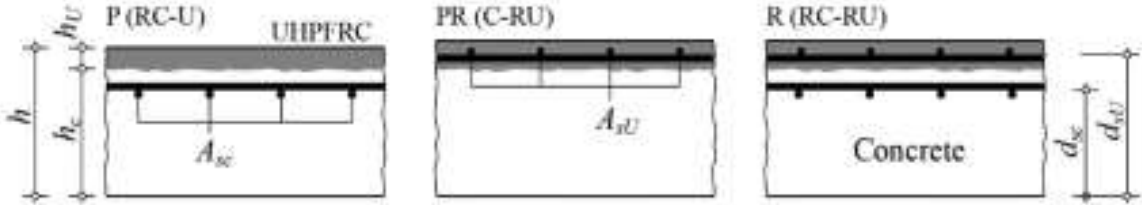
configurations for UHPFRC bridge deck strengthening, source: (Brühwiler, 2017)
